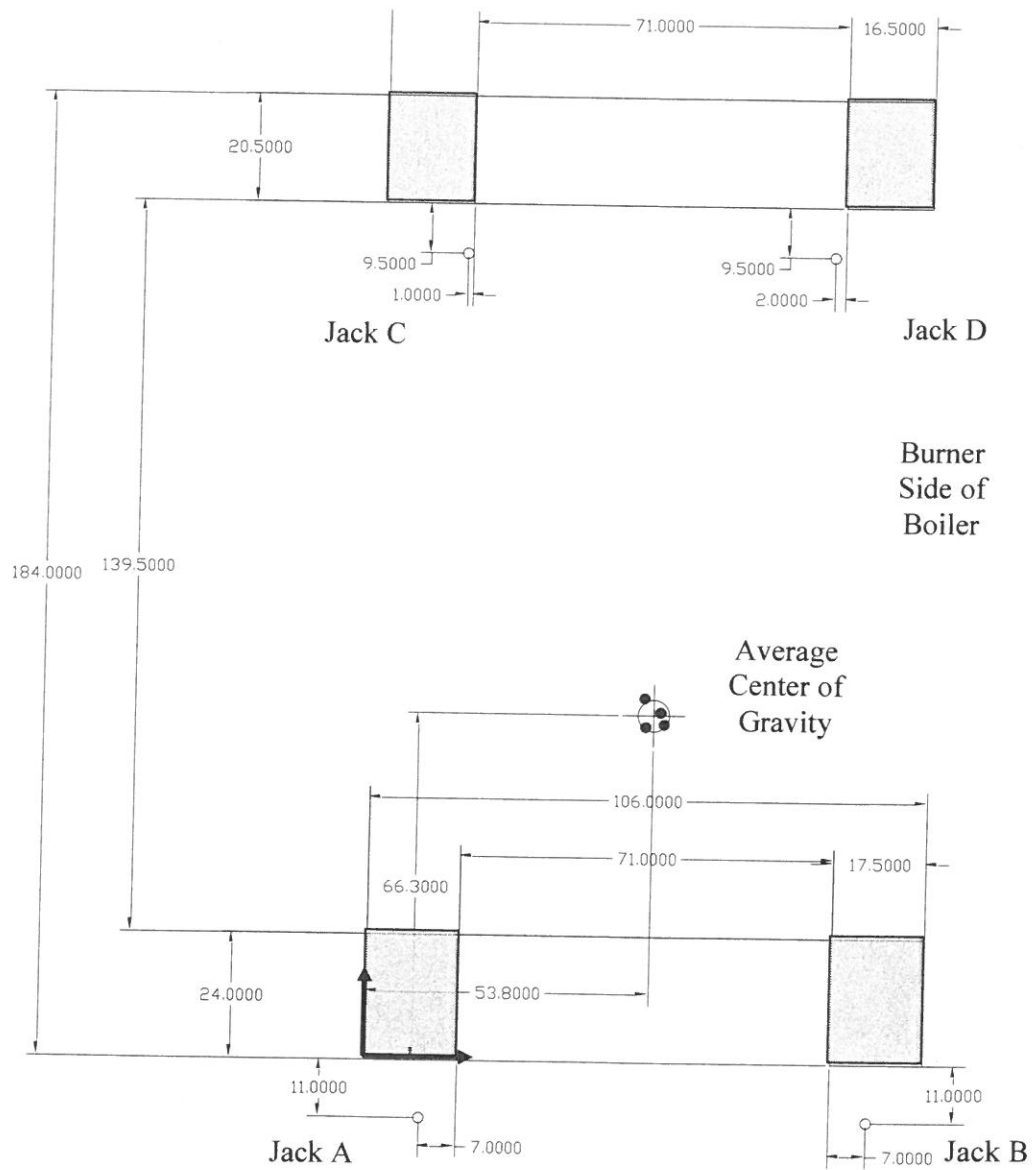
Lateral Dimensions of Boiler Supports, Lifting Points, and Center of Gravity
